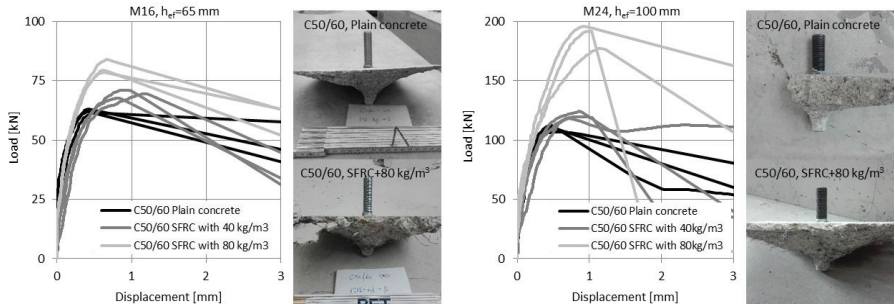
Load-Displacement curves from tension tests with bonded anchor on surface in different concrete types (Plain, SFRC with 40 and 80 kg/m³) and the corresponding failure mode, concrete cone breakout.
